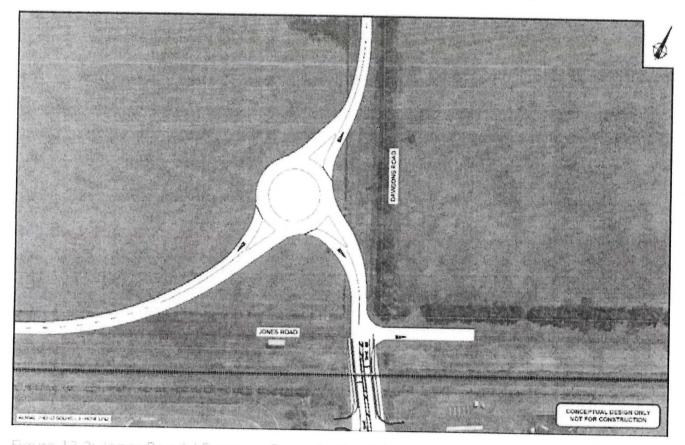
Jones Road / Dawsons Road Option 2 Staggered Intersection Concept
